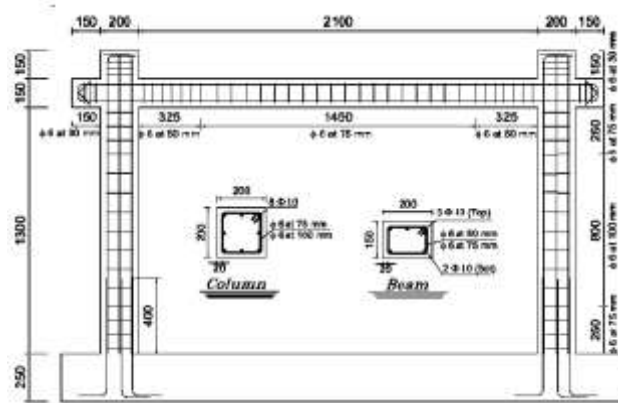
Geometry and reinforcing details of reinforced concrete frame (millimeter) (Mansouri et al., 2014)
